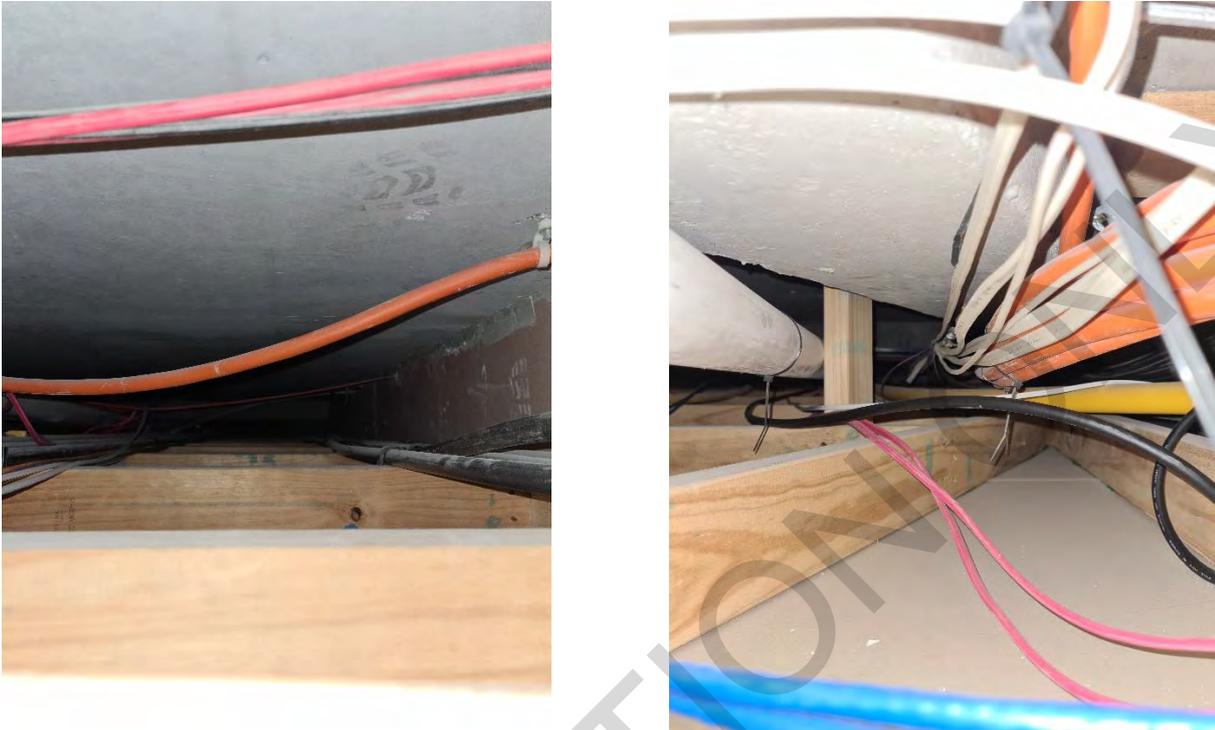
Ground Floor Concealed Spaces Adjacent to Smoke Doors
